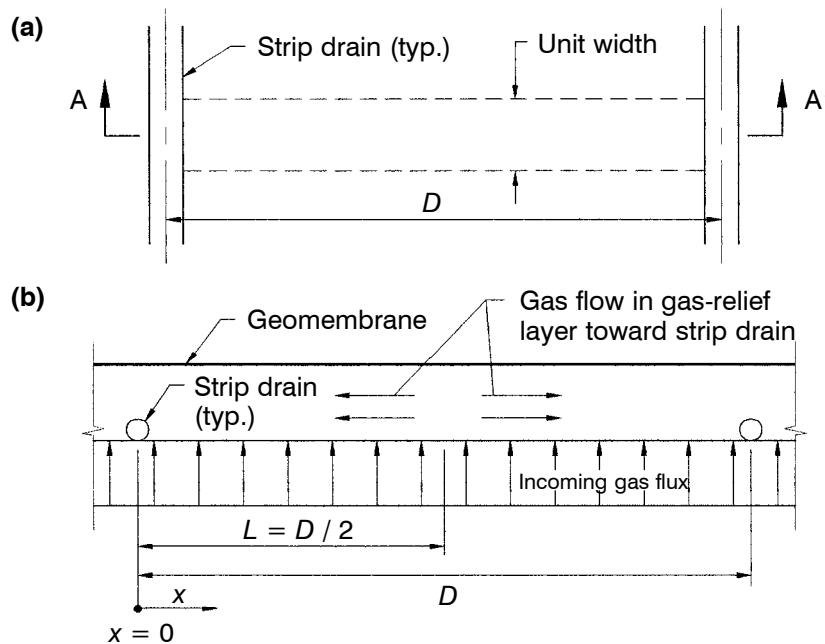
Model of gas flow to strip drains: (a) plan view; (b) cross-section A-A'.
